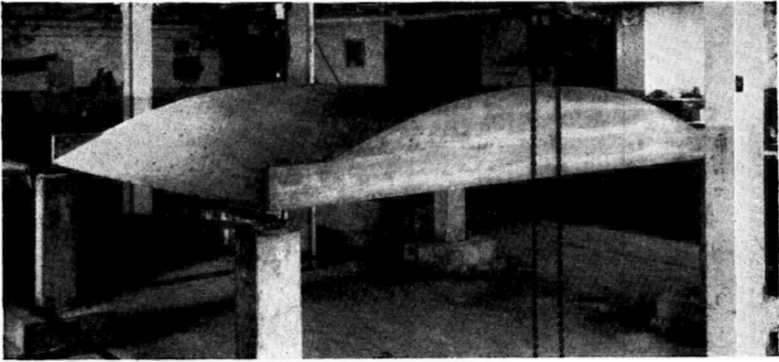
TYPICAL SHORT SHELL BEFORE TEST
